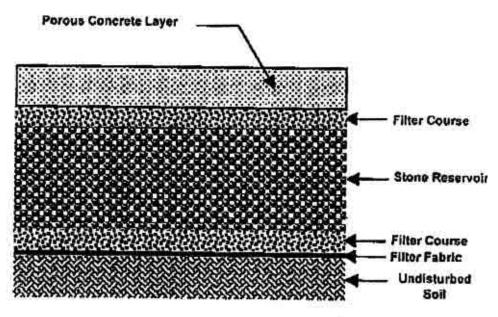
Porous pavement detail (Source: GSWMM, 2001)
